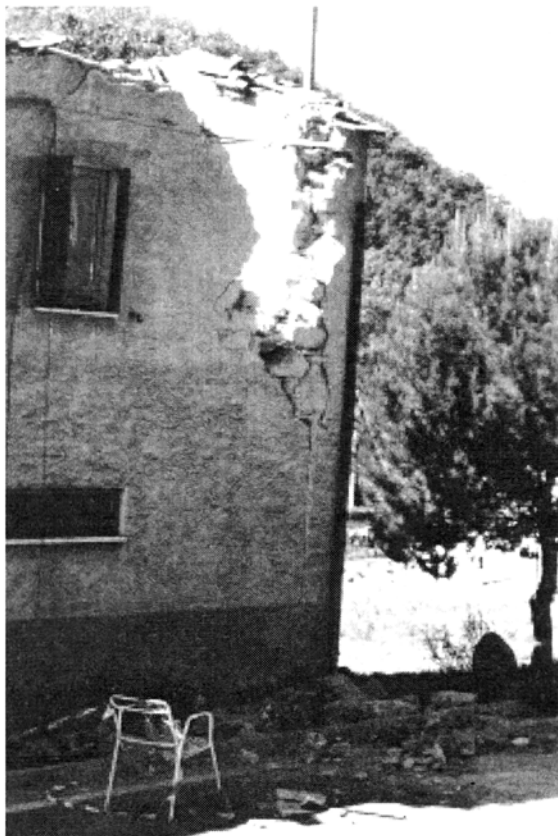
Out-of-plane wall failure: Casenove
